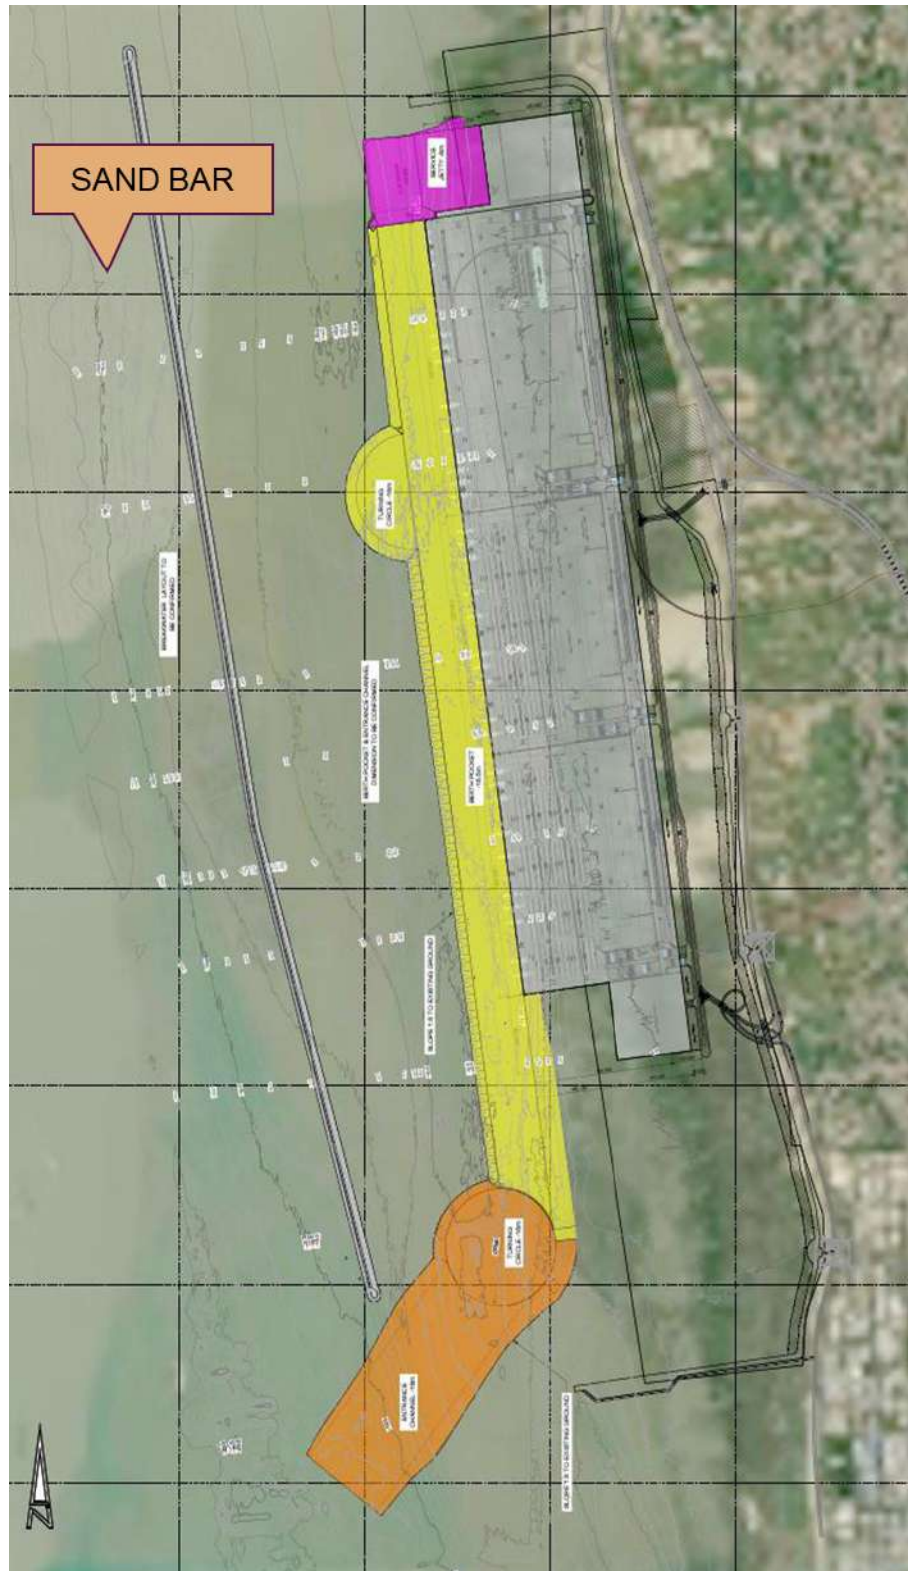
Layout Plan of the Proposed Bay Terminal
